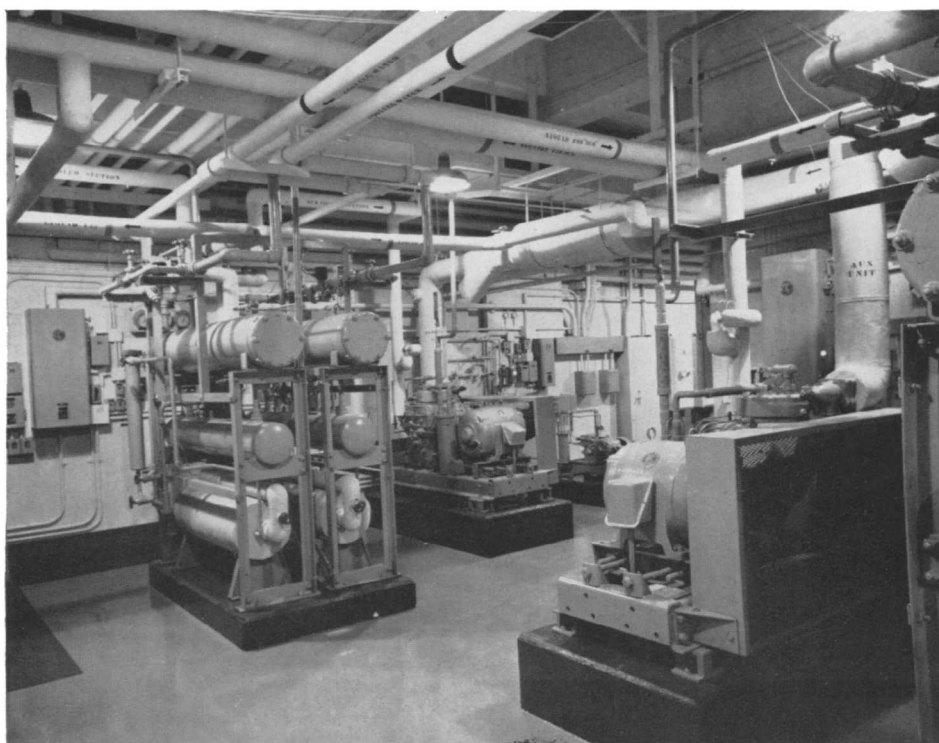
A view of part of the mechanical equipment room showing two of the 30-horsepower compressors with their associated equipment
